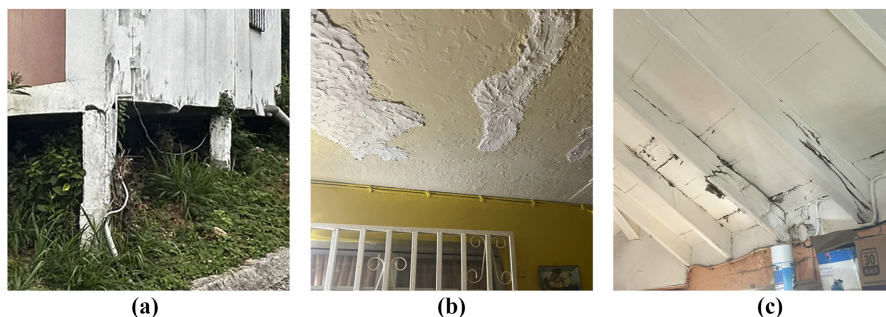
Examples of damaged elements (A) damaged concrete piles; (B) patched concrete ceiling; (C) damaged wooden rafters. Authors' own work
